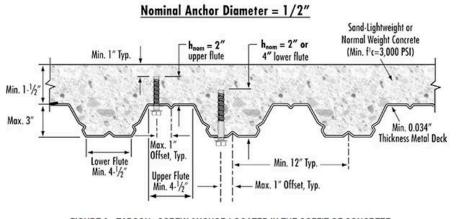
TAPCON+ SCREW ANCHOR LOCATED IN THE SOFFIT OF CONCRETE OVER STEEL DECK FLOOR AND ROOF ASSEMBLIES (1 inch = 25.4 mm)
